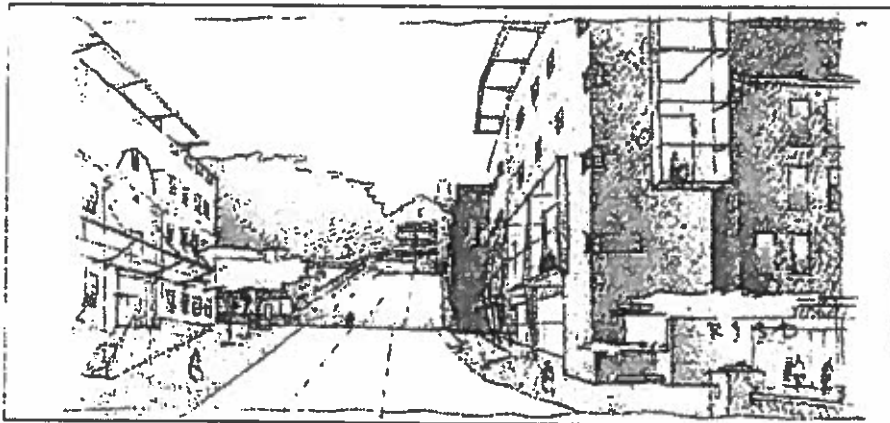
Conceptual view of Washington Place, looking east to The Beach and Homer Hall
